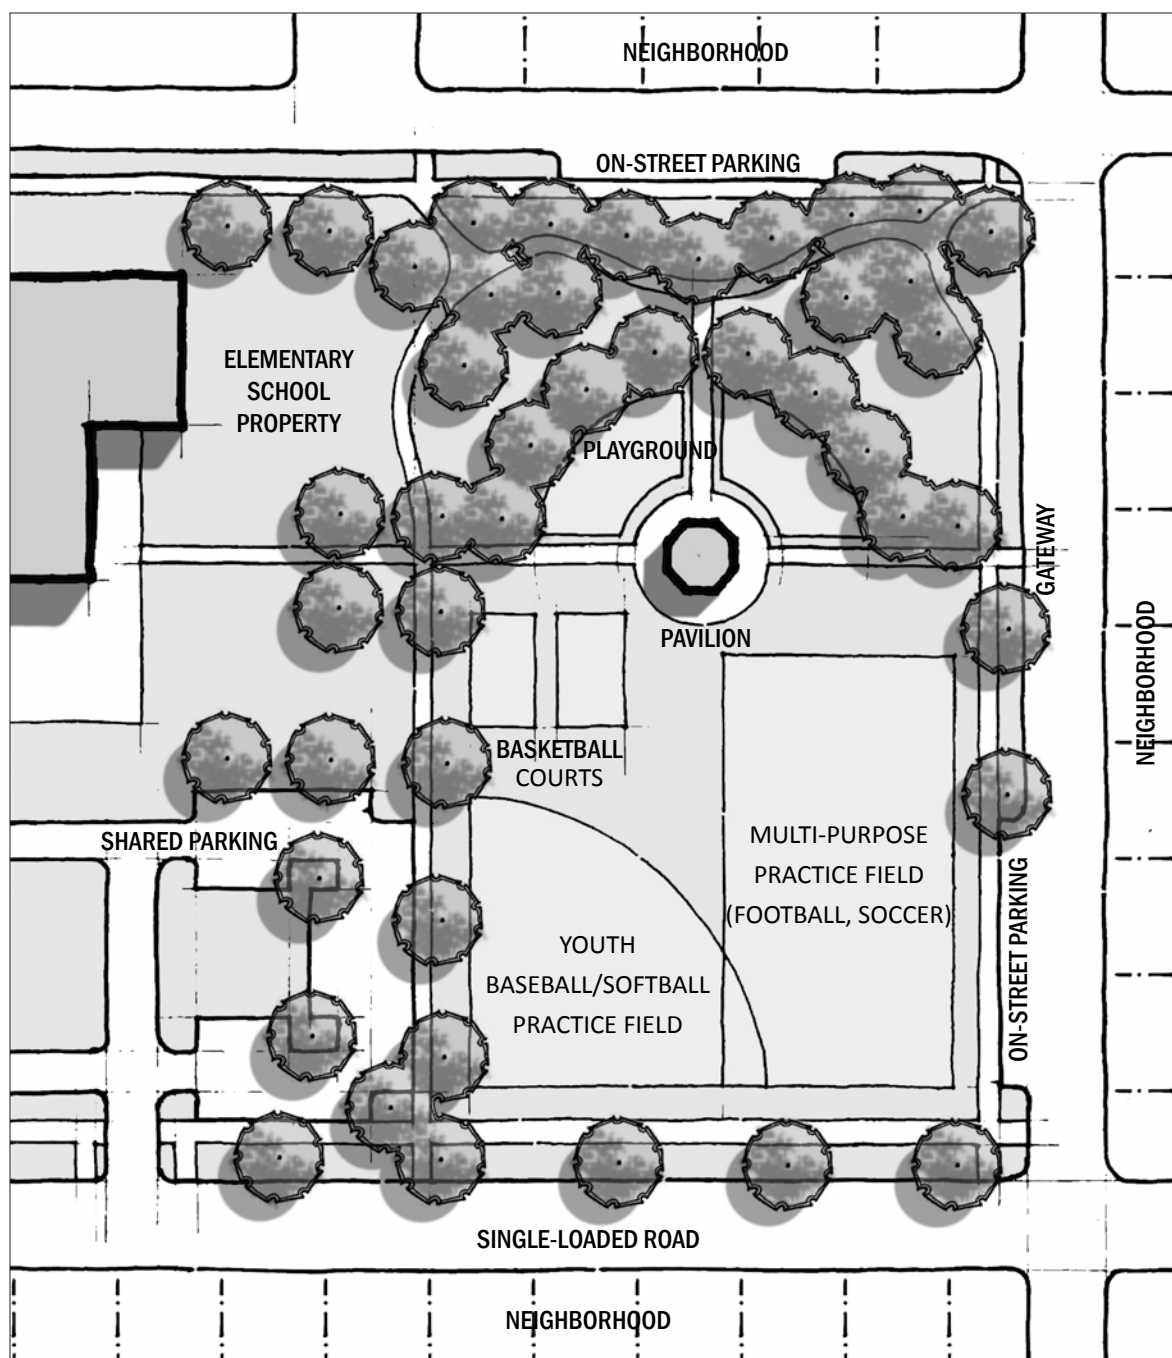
Typical Neighborhood Park Layout (not to a scale)
